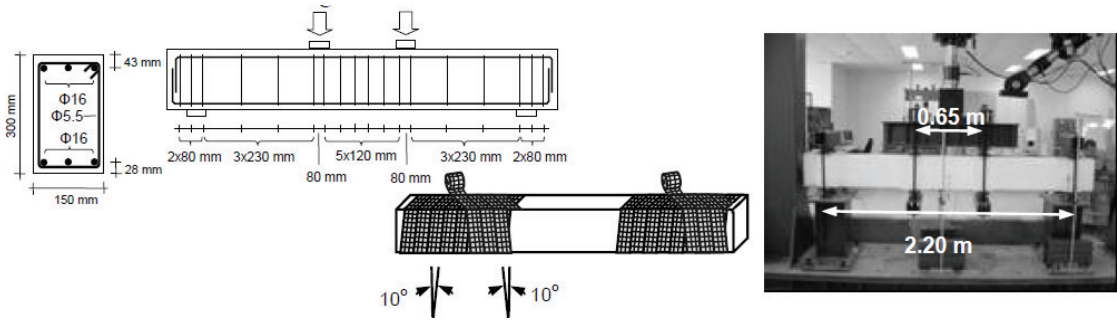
Geometry of the beams, detail of the reinforcement and test setup
